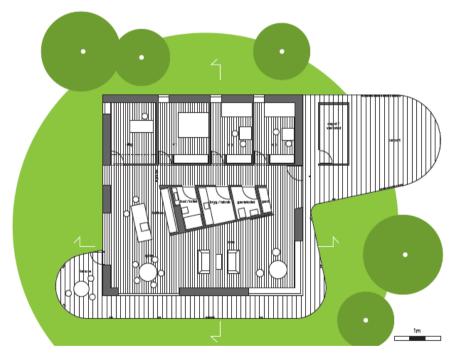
Case Study floor plan Source: Saint Gobain Isover A/S
